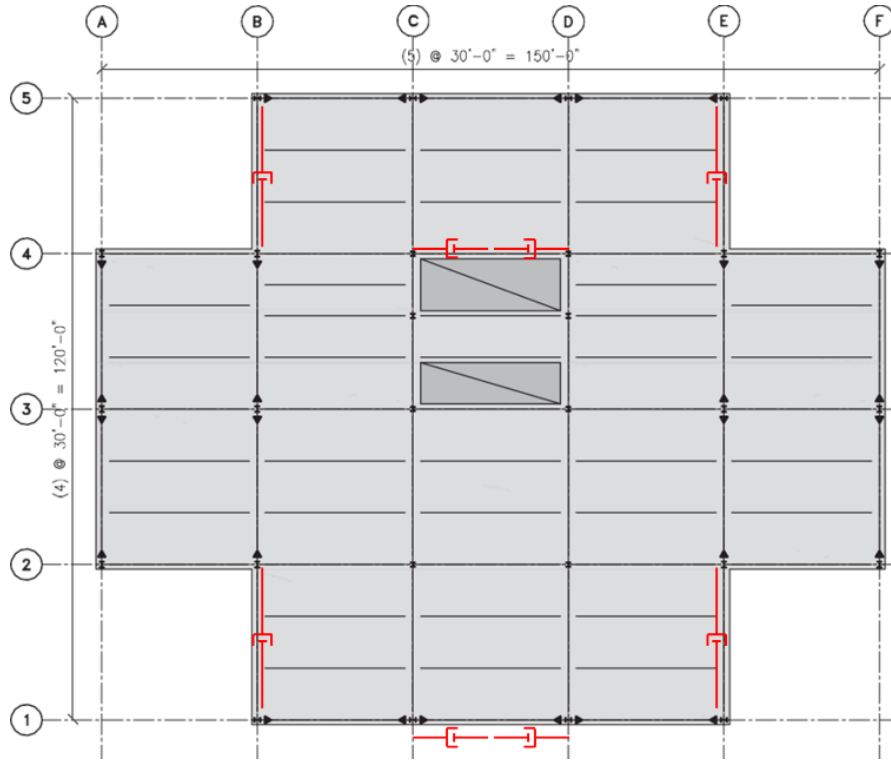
Floor plan showing damper locations in red of the SMF-VD
